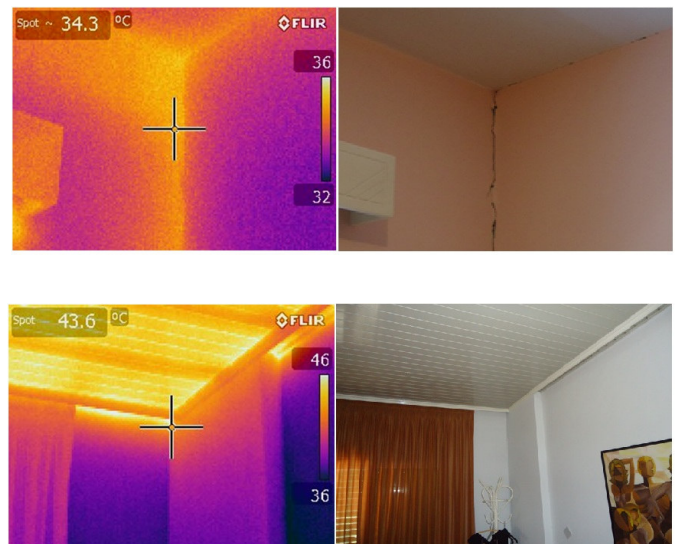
Thermal Bridge on the exterior wall of PP. 25
